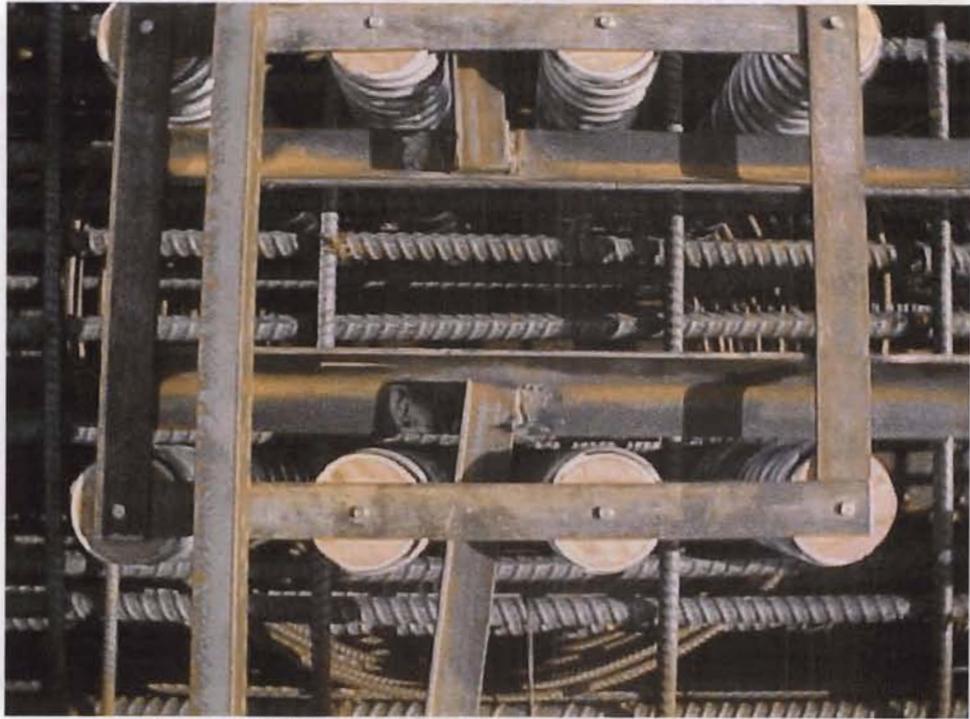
Plan View of Grout Tubes and Rebar Cage
